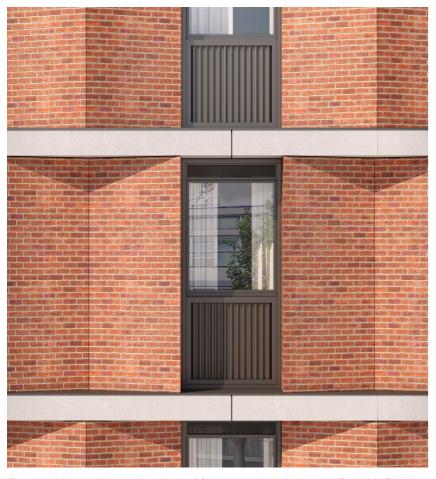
View 2 - Illustrative visual of facade detail study to the Affordable Block
